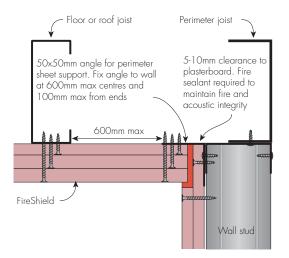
Fire Rated Ceiling to Wall Direct fixed to joist
